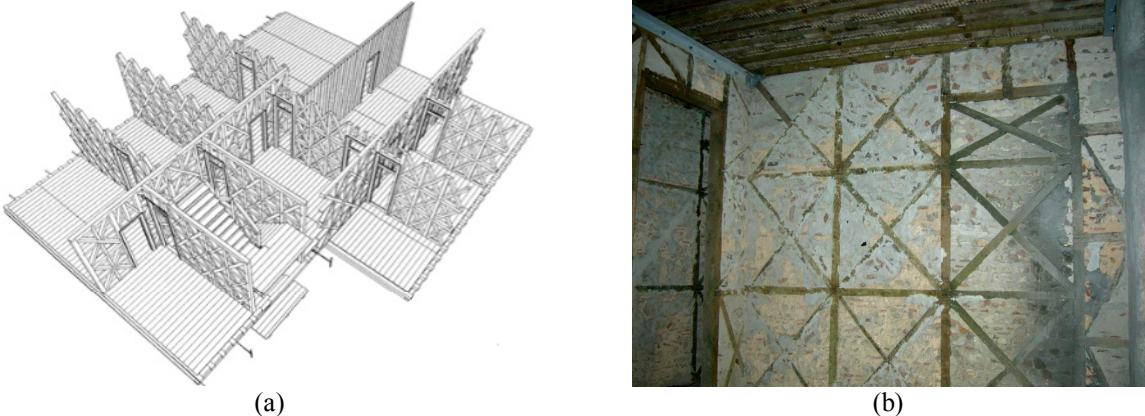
Examples of *gaiola pombalina*: (a) general floor plan [5]; (b) detail of half-timbered wall [6]
